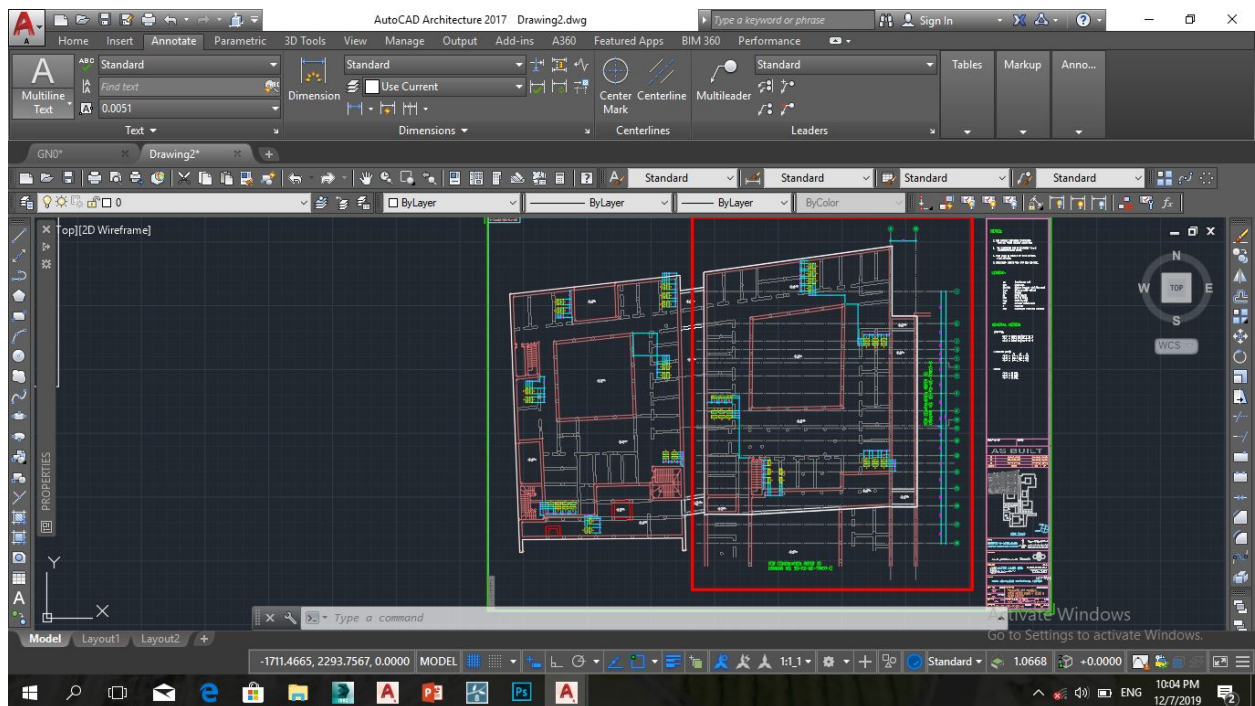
Murabba Palace AutoCAD drawing first-floor plan (details)
